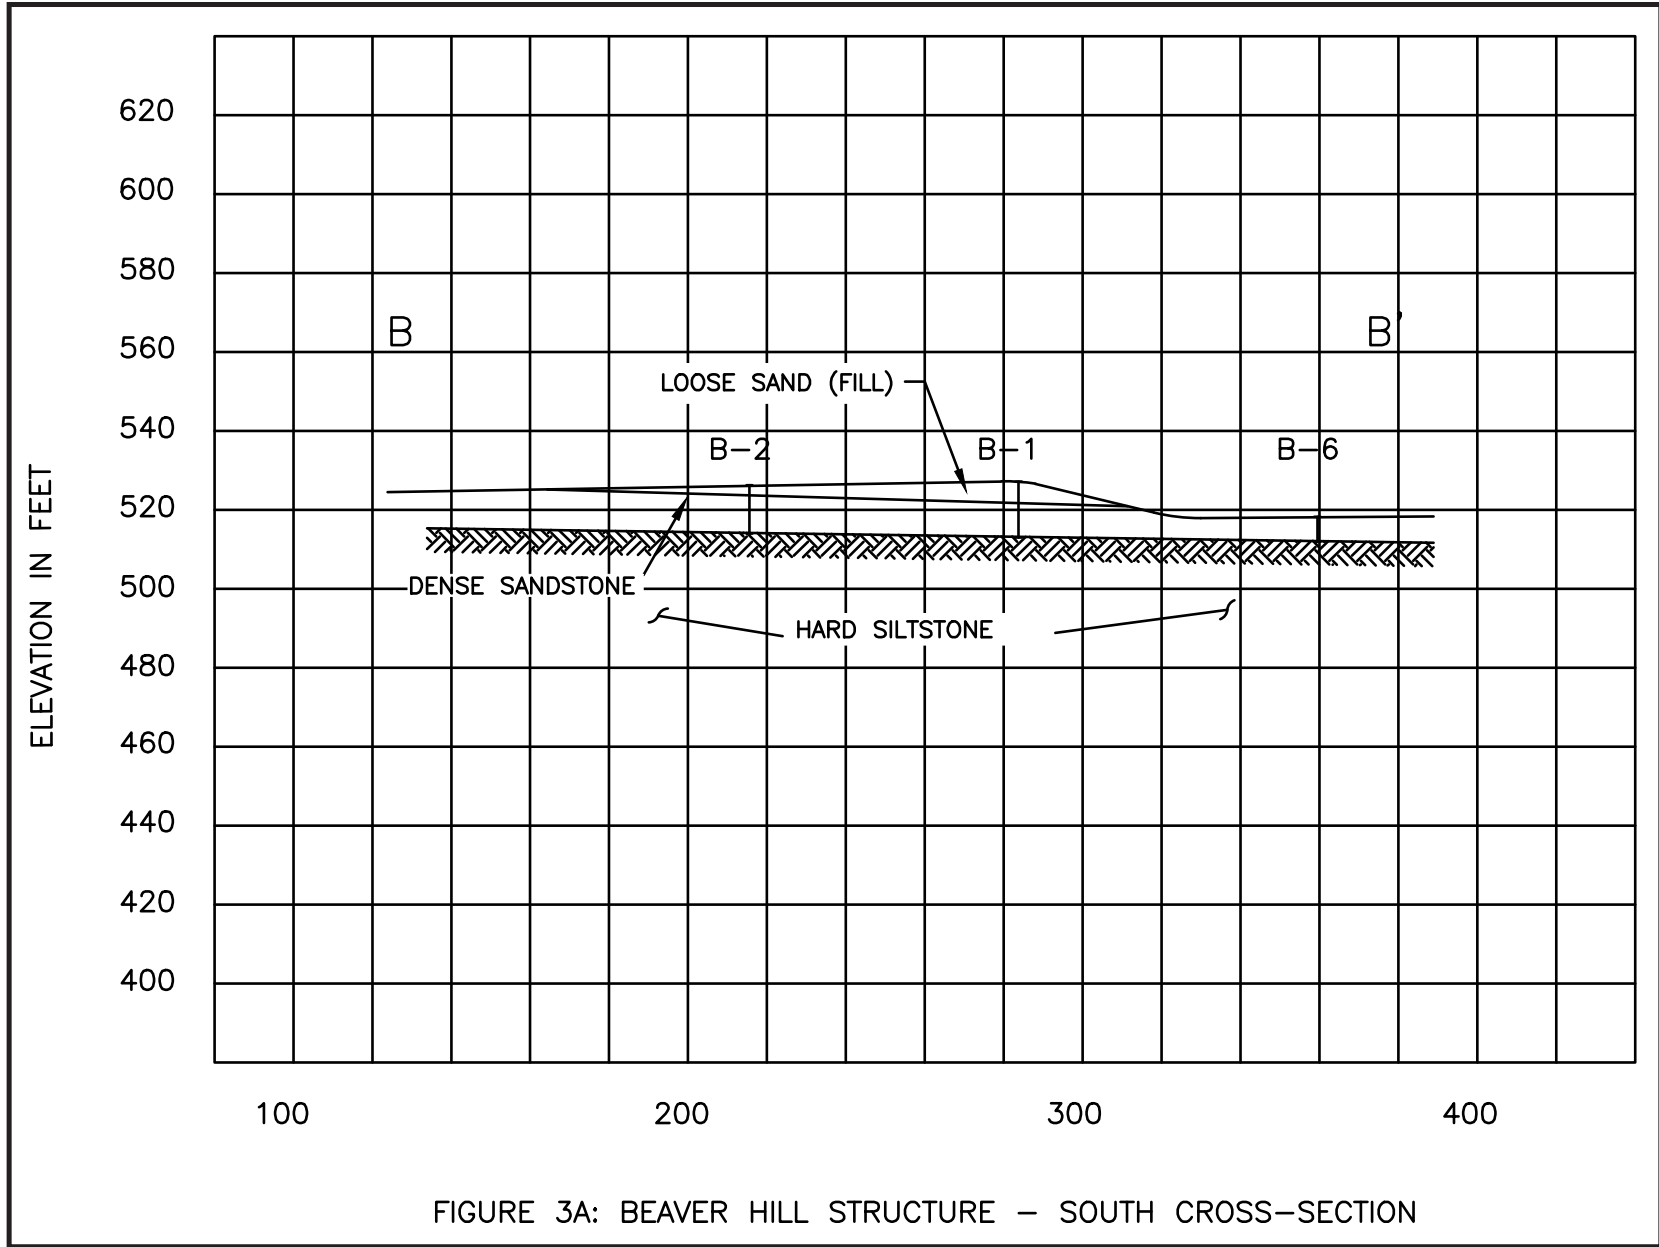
A: BEAVER HILL STRUCTURE - SOUTH CROSS-SECTION
